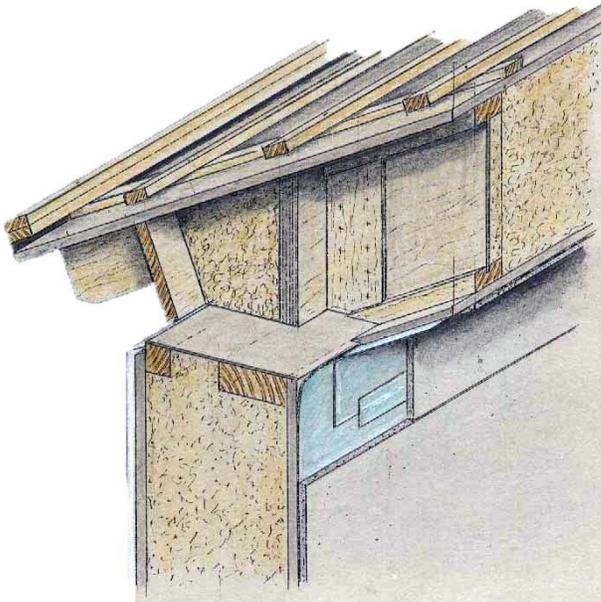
, Connection of wall to roof with FJI beams (Fingerling 2004)
